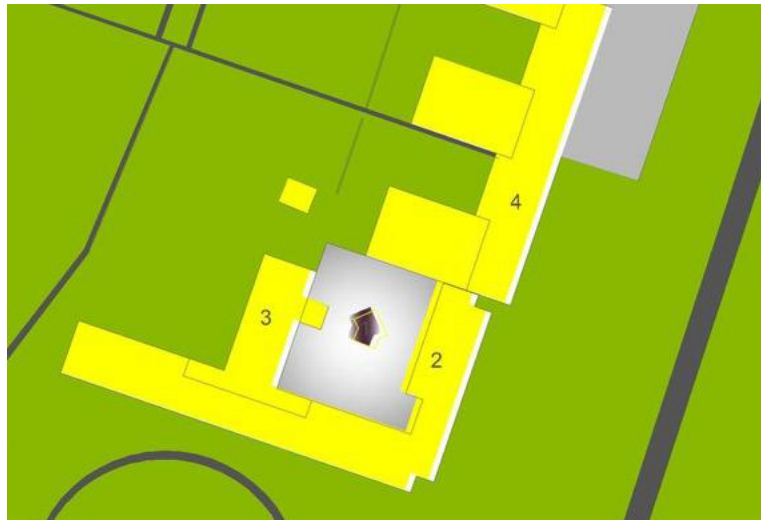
ZEB on constructible surface: 1 – ZEB; 2 – hydrotechnical building; 3 – hydraulics laboratory; 4 - hydrotechnical building –II.
